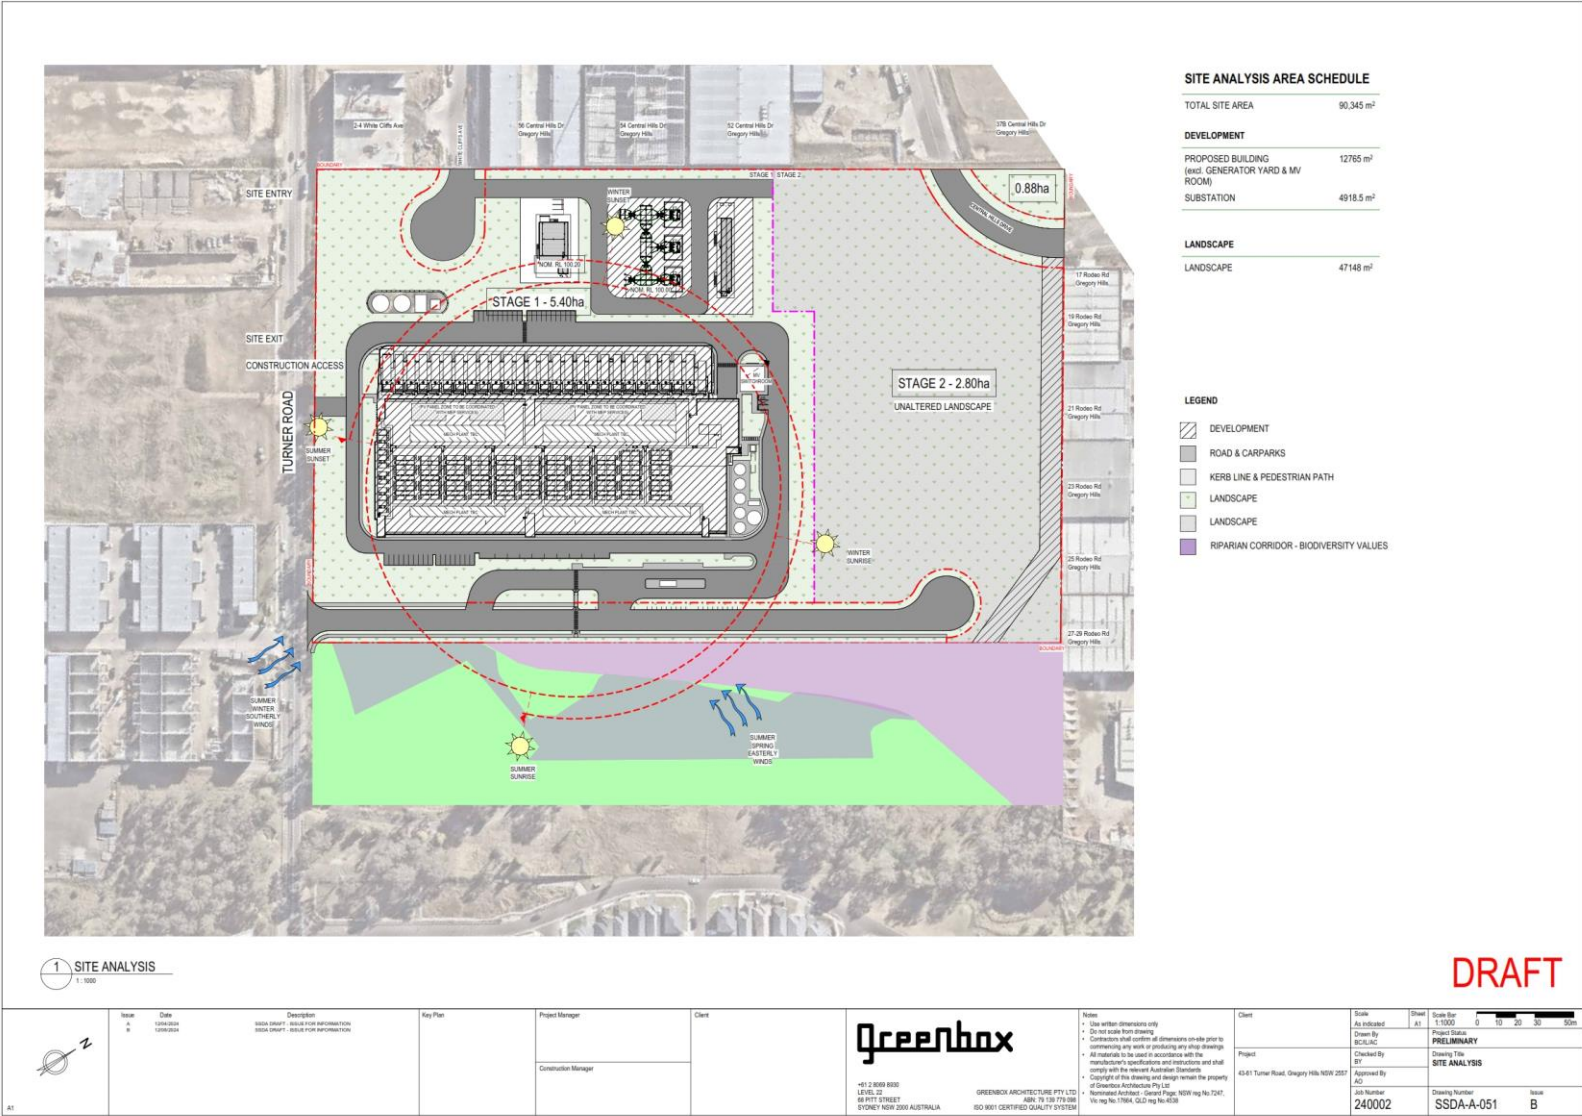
Proposed Site Plan (Source: Greenbox Architecture 2024)
